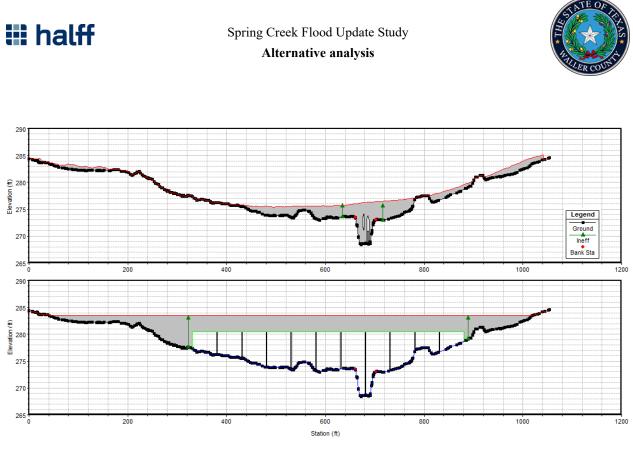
Alternative PA2 Existing and Proposed Structure Cross-Sections at Kyle Road
